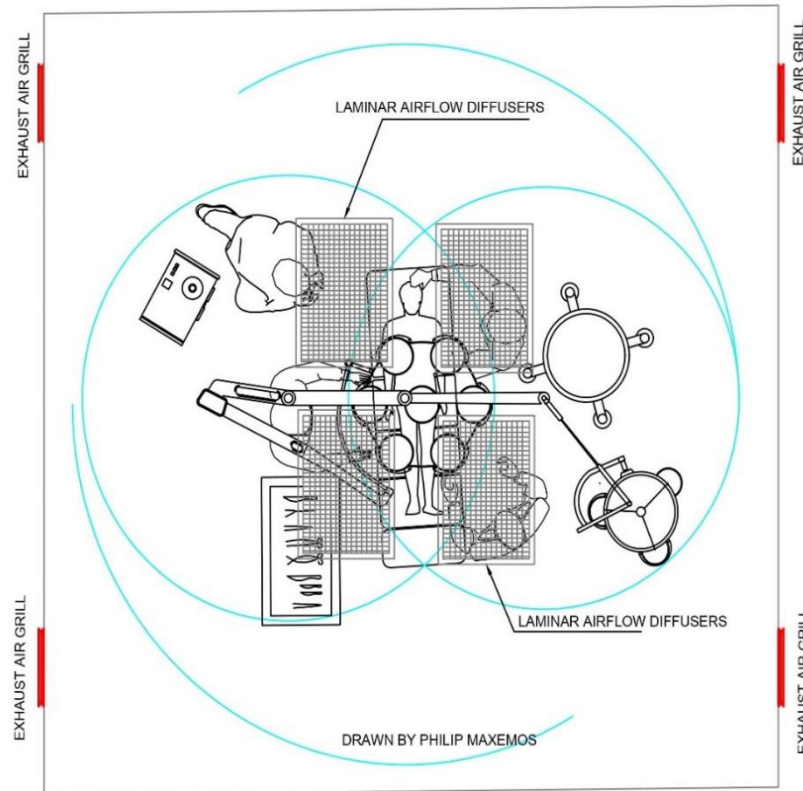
Shows the locations for laminar airflow diffuser in the false ceiling with exhaust air grilles at sidewalls.
